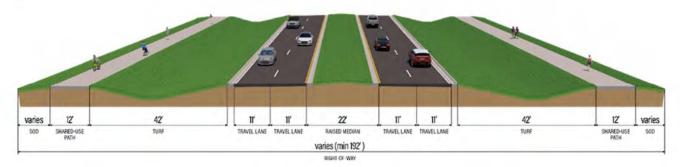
Suburban Typical Section (Segments 1, 4, and 6)
